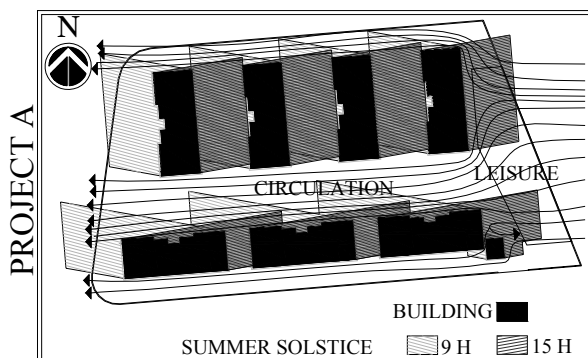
Shading and ventilation in the summer solstice day in house-building A.
